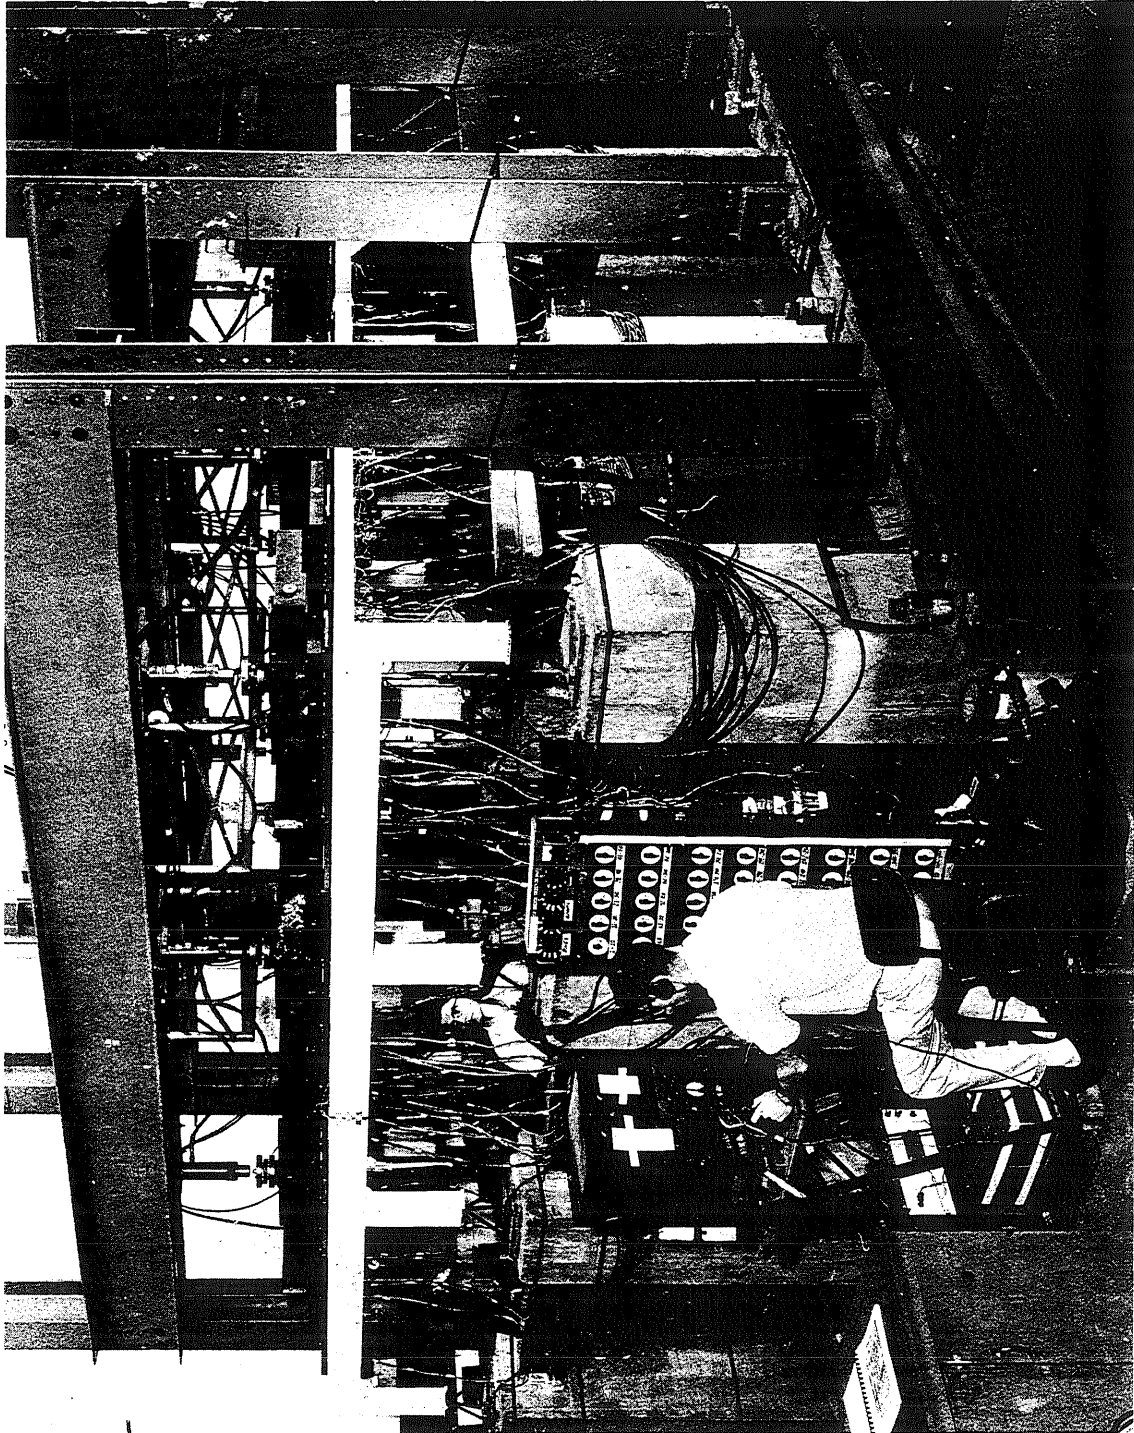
VIEW OF TEST STRUCTURE SHOWING INSTRUMENT PANELS
